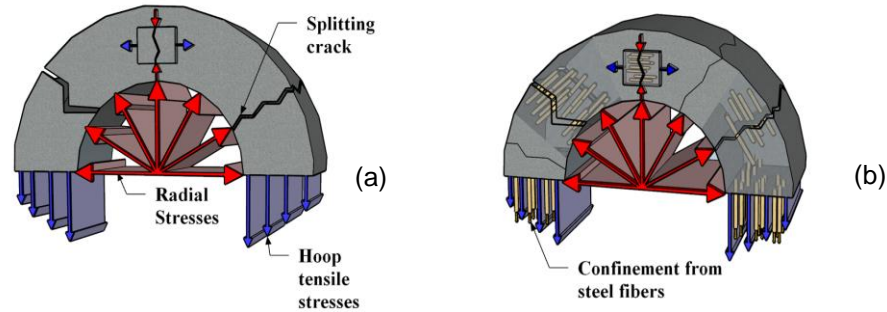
(a) Splitting crack and (b) multiple cracking due to fiber bridging
